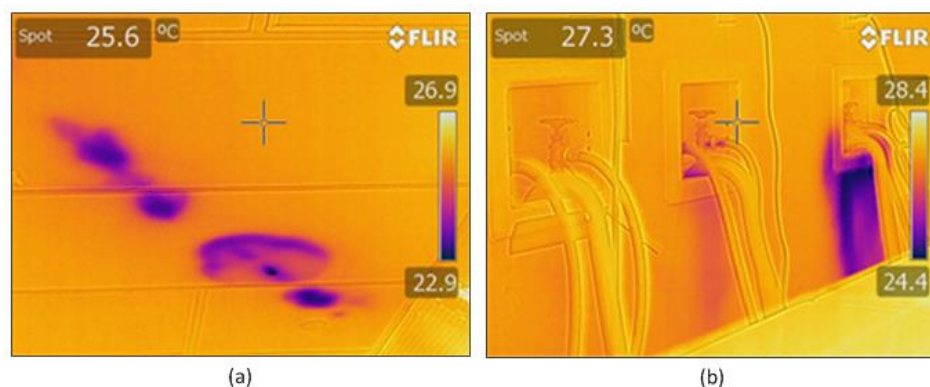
Thermography of interior wall surface with water leaking on the ceiling and in the wall
